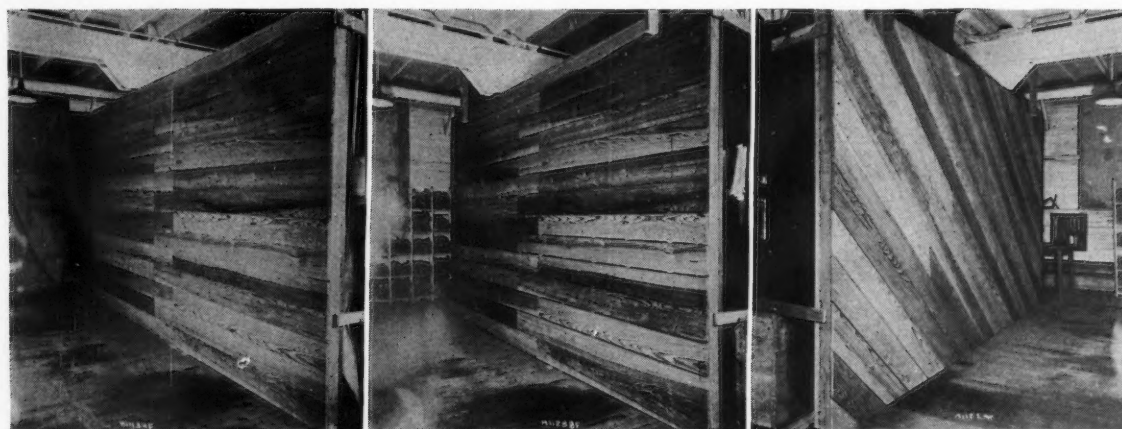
(Left) Green horizontal sheathing when first nailed onto frame. Fig. 8 (Middle) Panel horizontally sheathed with green lumber, after seasoning for thirty days. Cracks represent $\frac{5}{8}$ inches shrinkage in 9-foot height. Moral: Use dry lumber. Fig. 9. (Right) View of panel diagonally sheathed with green lumber and allowed to season one month. Stiffness reduced 55 per cent
